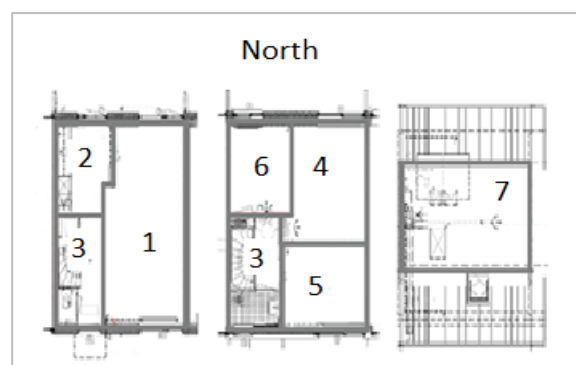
Plan of the modelled passive house, from left to right: ground floor, first floor, attic
